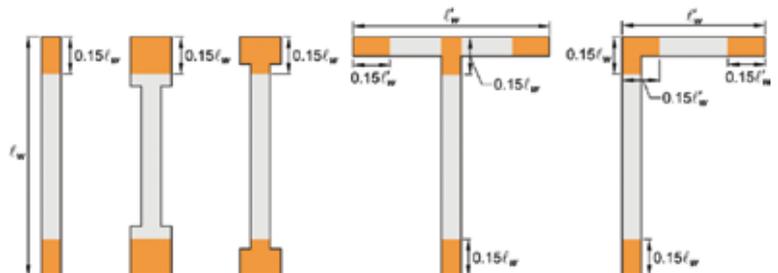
Various wall configurations showing end regions requiring longitudinal reinforcement per 18.10.2.4(a) (ACI 318-19, Fig. R18.10.2.4')
